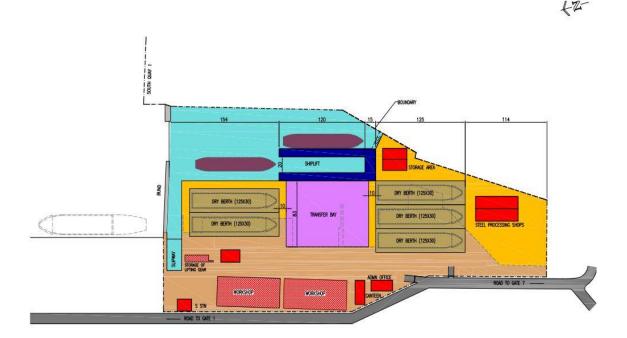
Proposed Layout of Boat Basin/Timber Pond – Shiplift
